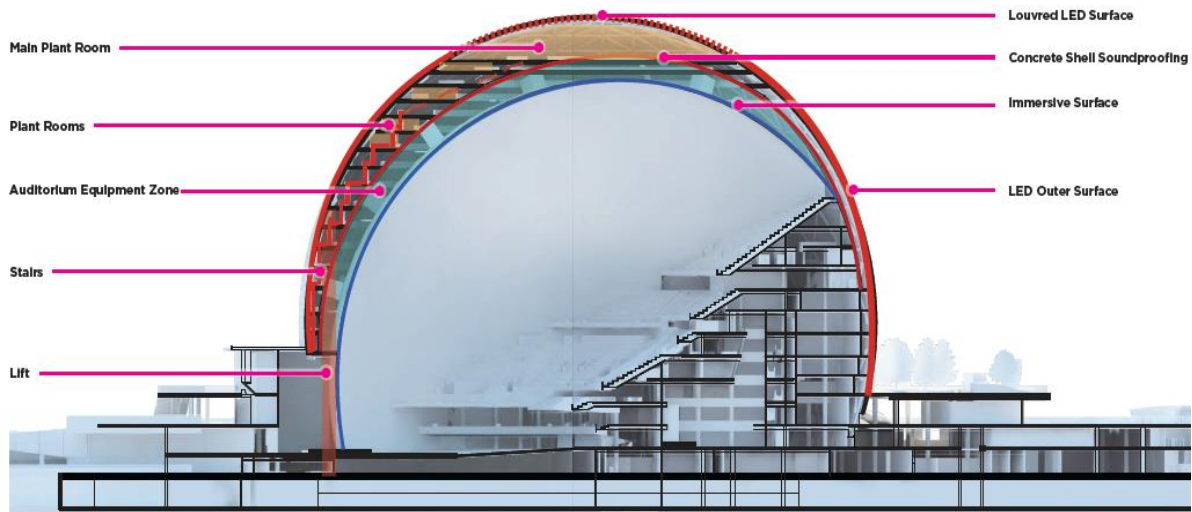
Cross-section of Sphere plant rooms and mechanical / servicing equipment (extract from DAS)
